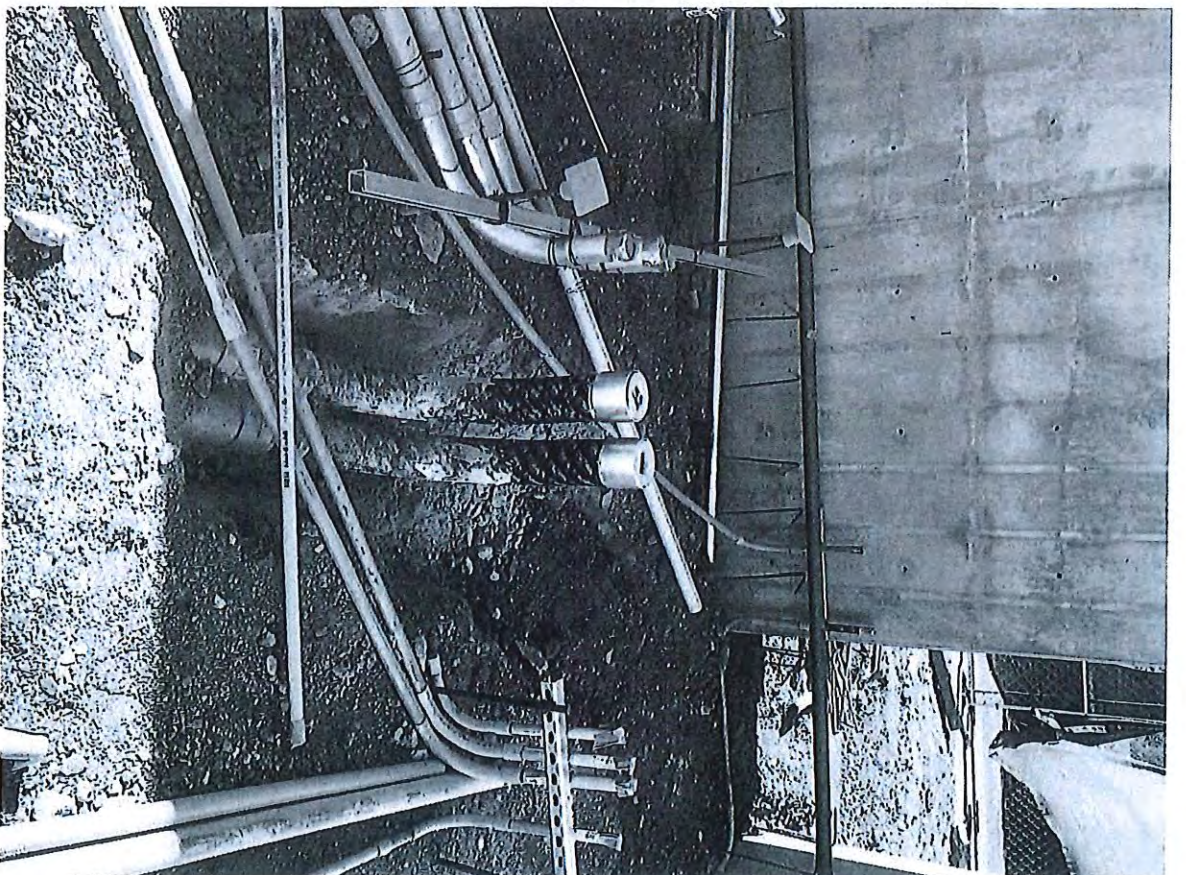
PHOTO OF EXISTING CONDITIONS- ROOM 2166
